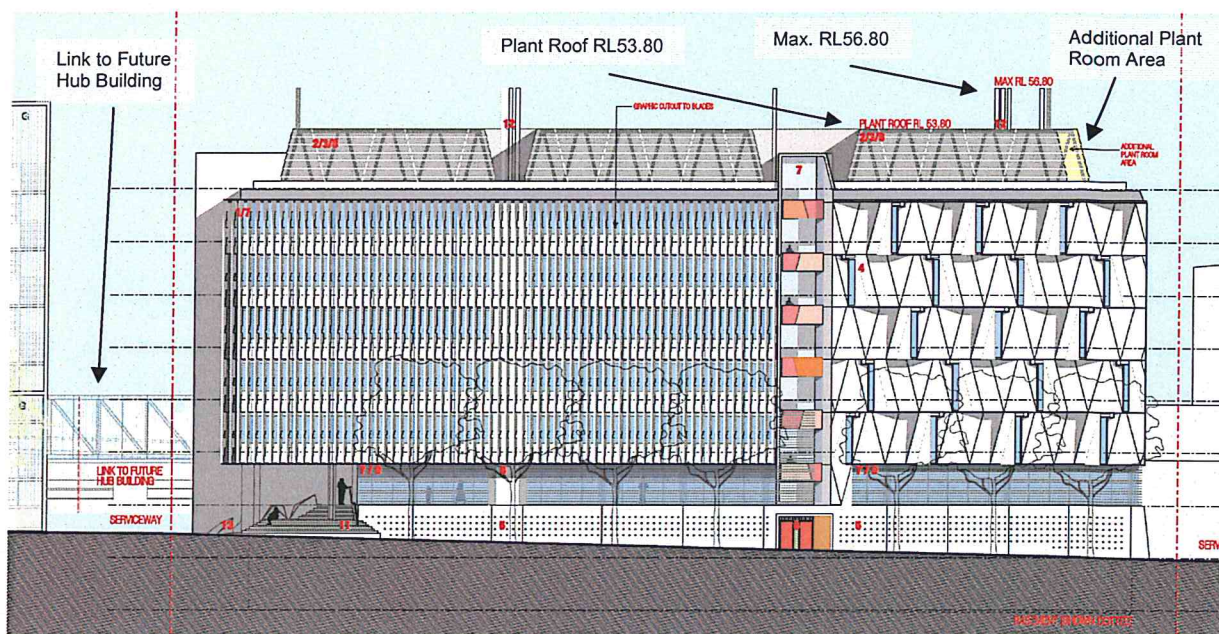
Hawkesbury Road elevation of the CMRI building (as proposed)
